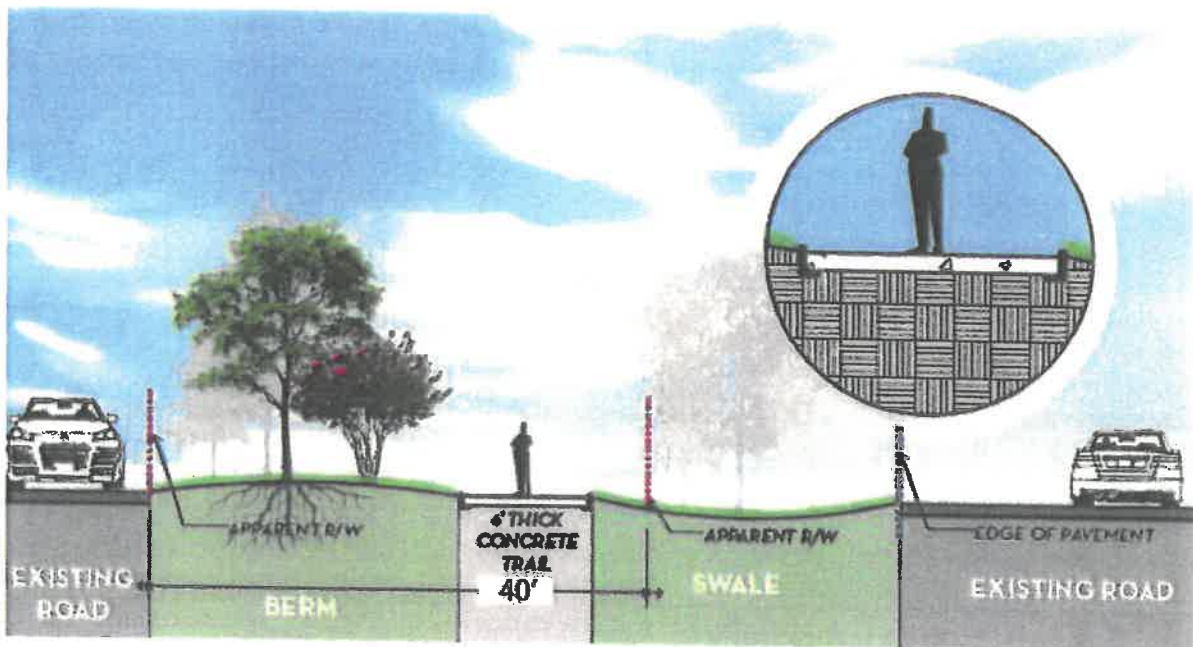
At-Grade Trail for Low-Elevation Areas
